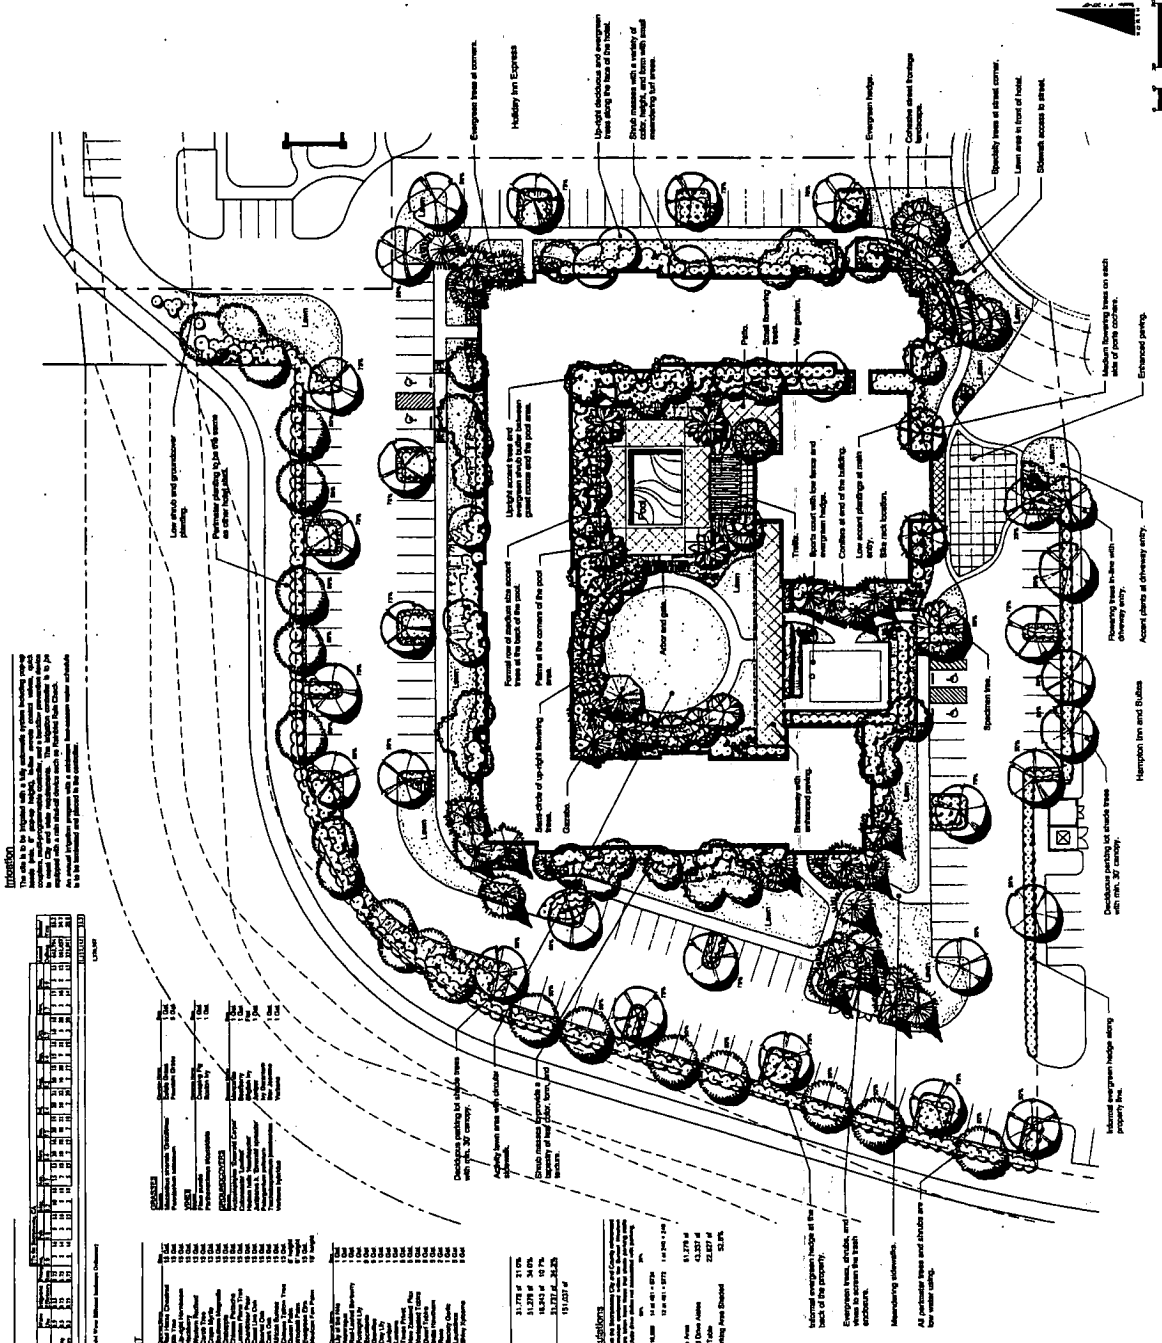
Special Permit D - Parcel 10 Landscape Plan
